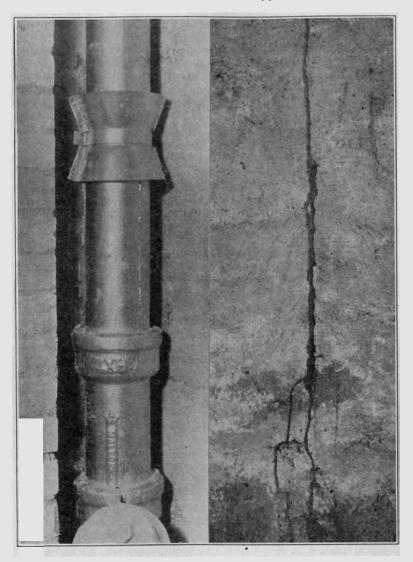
Metal shield on soil pipe in chase. Top funnel filled with plastic coal-tar pitch. Main shield (not shown) protects the chase. Right, shelter tube built down from sill to basement floor to secure additional moisture.
